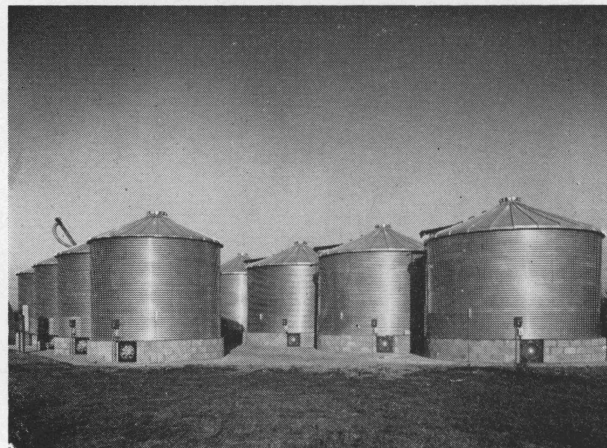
A group of bins on concrete block foundations. The blocks form an air chamber (plenum) for the drying system and false floors are used for the air distribution system.
